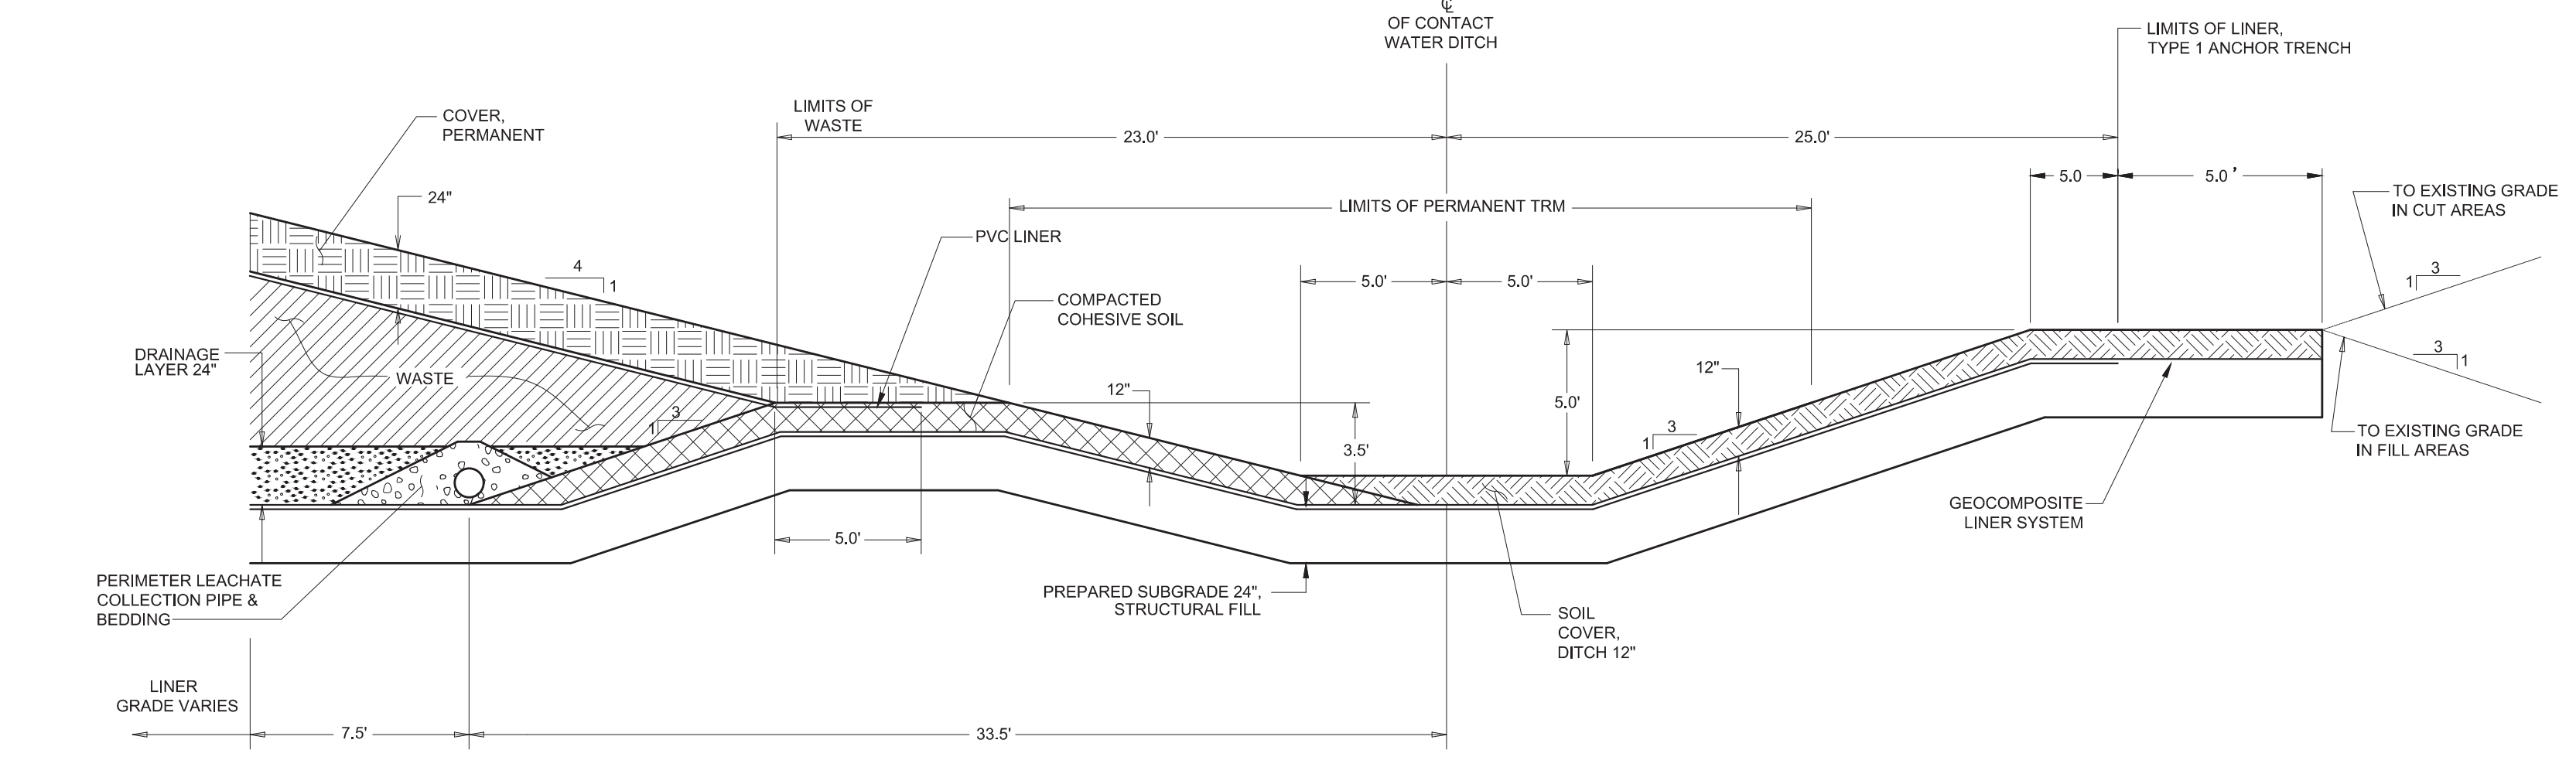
TYPE 2 PERIMETER CONTACT WATER DITCH CROSS SECTION
